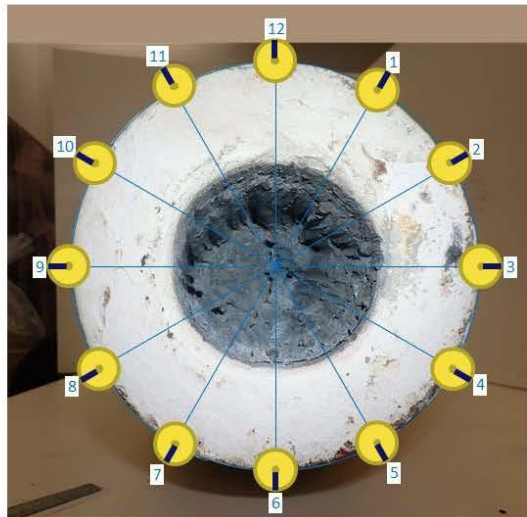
Clock positions used to describe the locations of the wire fractures within the socket, with 12 o'clock associated with the top of the socket.
